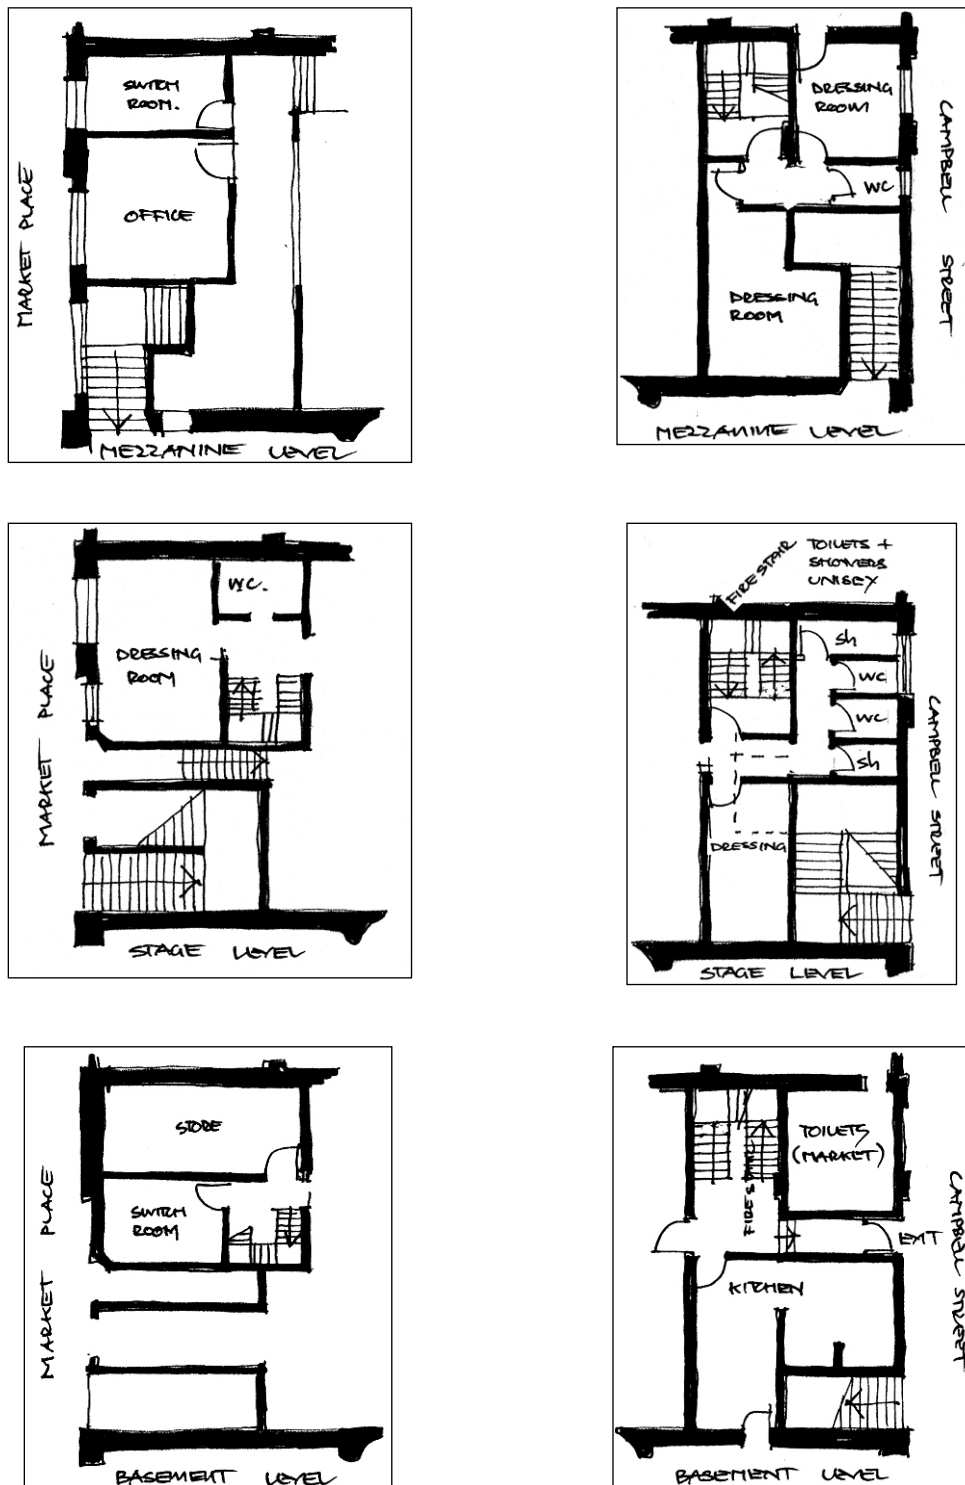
Potential layouts of the two backstage dressing room areas showing basement, stage and mezzanine level plans. Note the new fire stair and ground level exit to Campbell Street.
